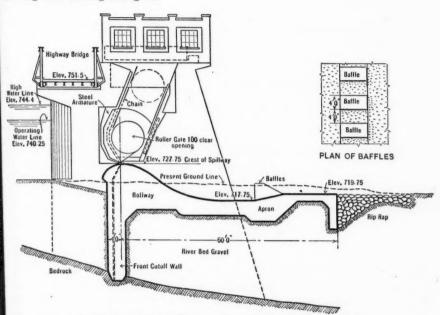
TYPICAL SECTION THROUGH SPILLWAY, LEABURG DAM.
